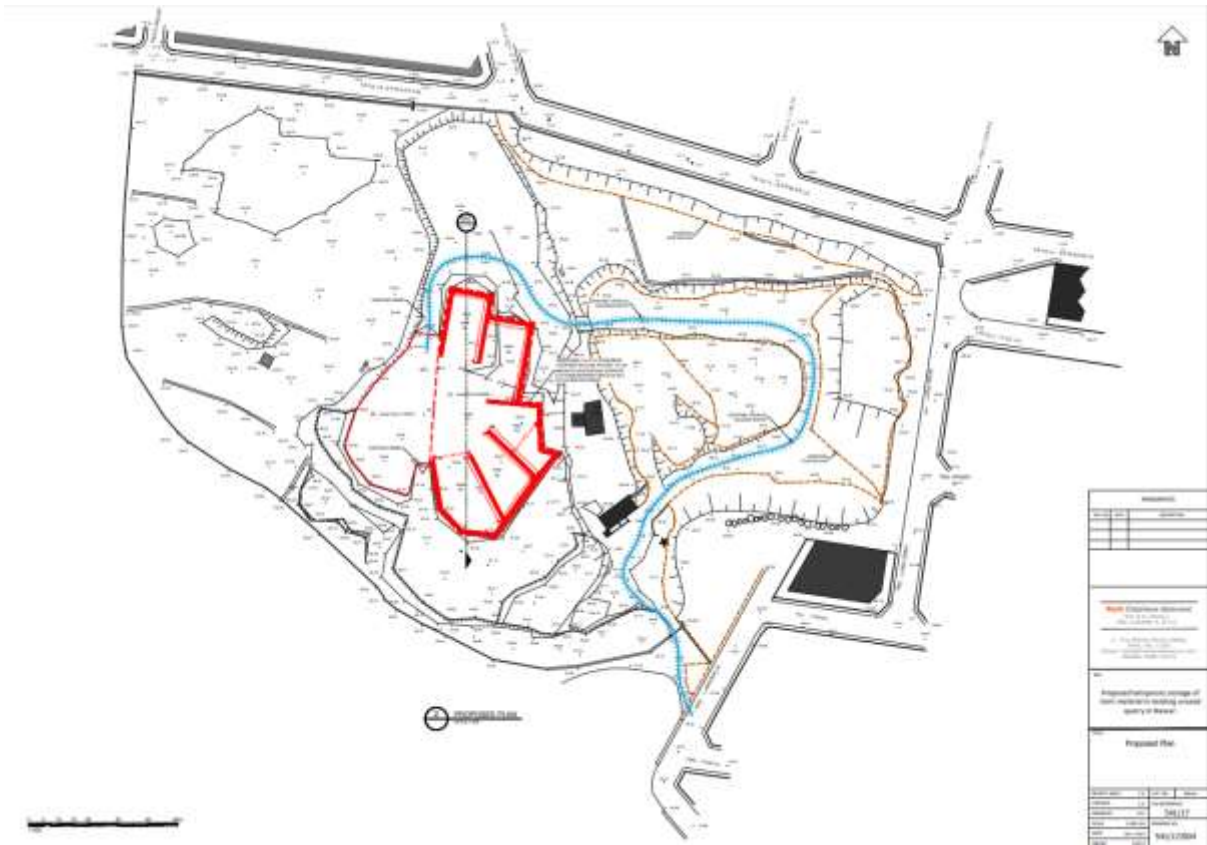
Block Plan (Source: PA/02581/18/Doc.1e)
